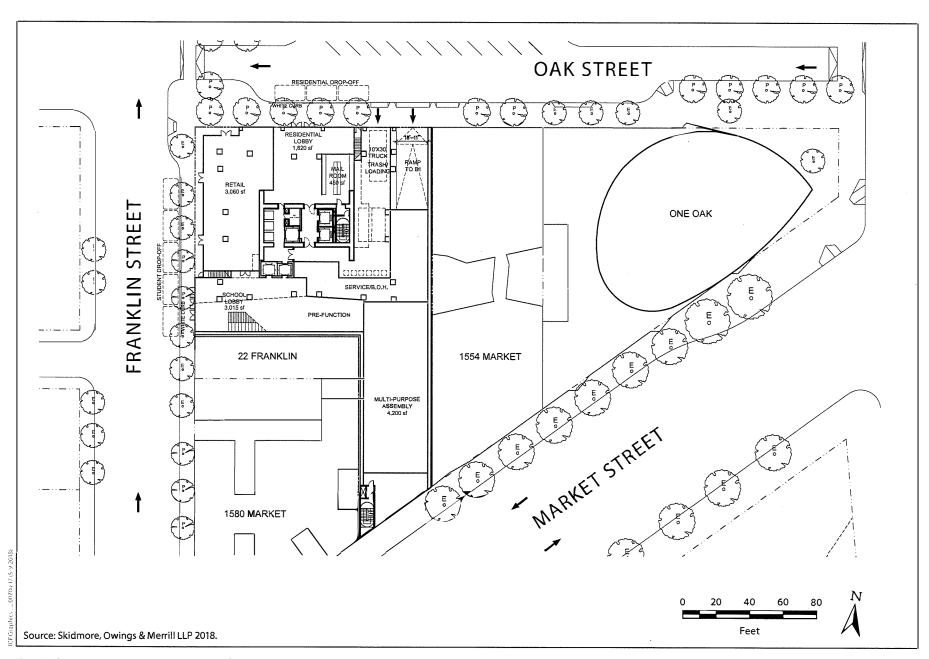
98 Franklin Street Project – Proposed Ground Floor Plan
